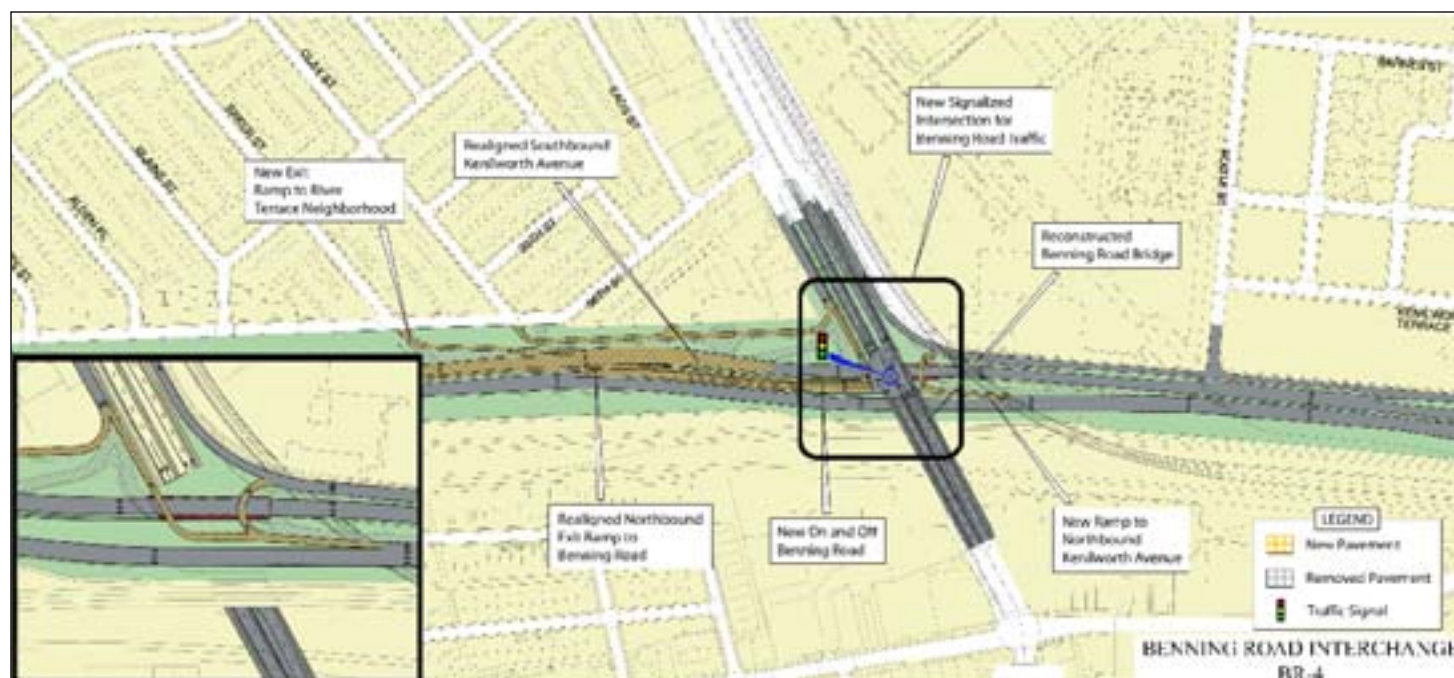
Scenario BR-4 (Benning Road Bridge reconstructed as a split structure to improve vehicular, pedestrian and bicycle safety)
